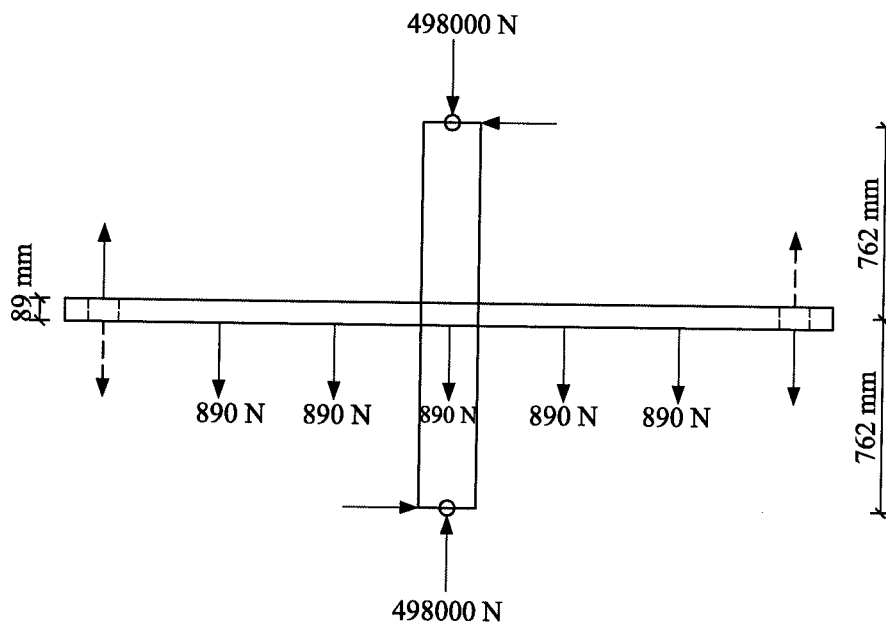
Loading Arrangement of (Islam and Park (1976)) Test Specimen
